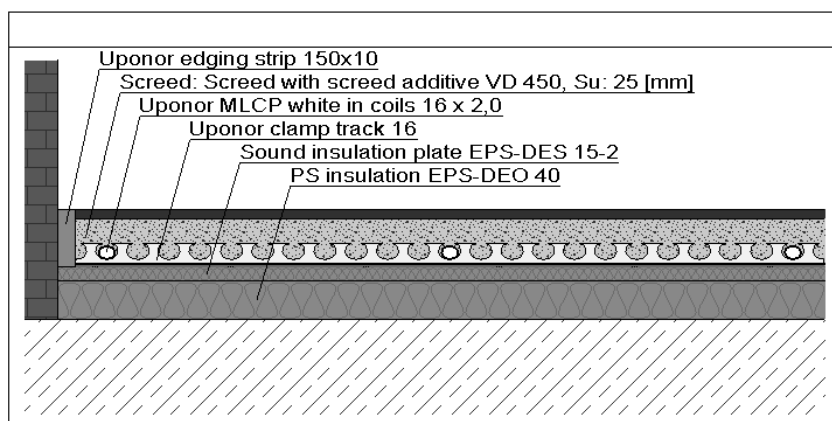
Heating floor, wet system. The arrangement of the system layers with the clamp track 16 (Uponor system)
